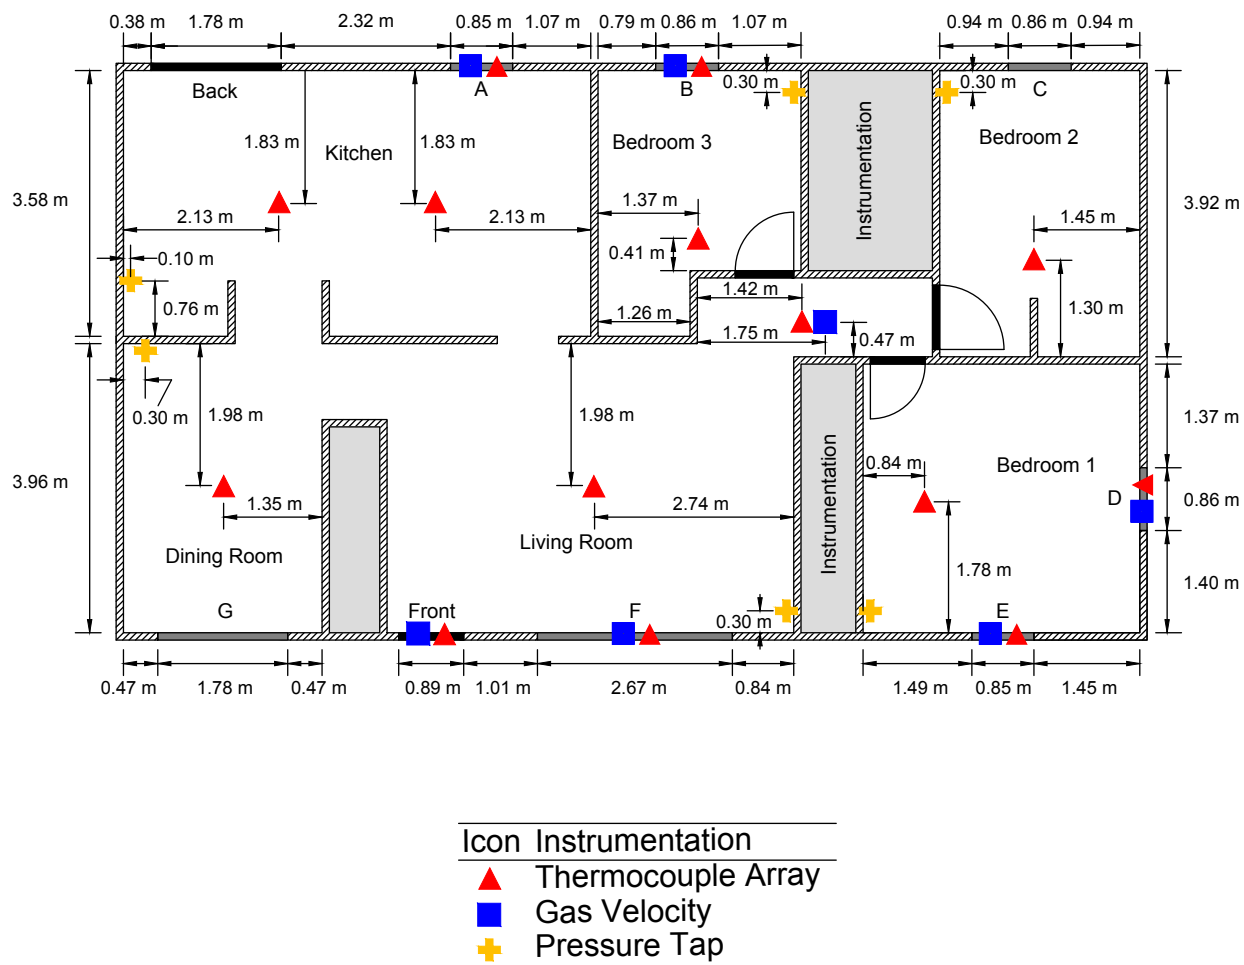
Layout of the one story ranch-style house in the UL/NIJ experiments.
